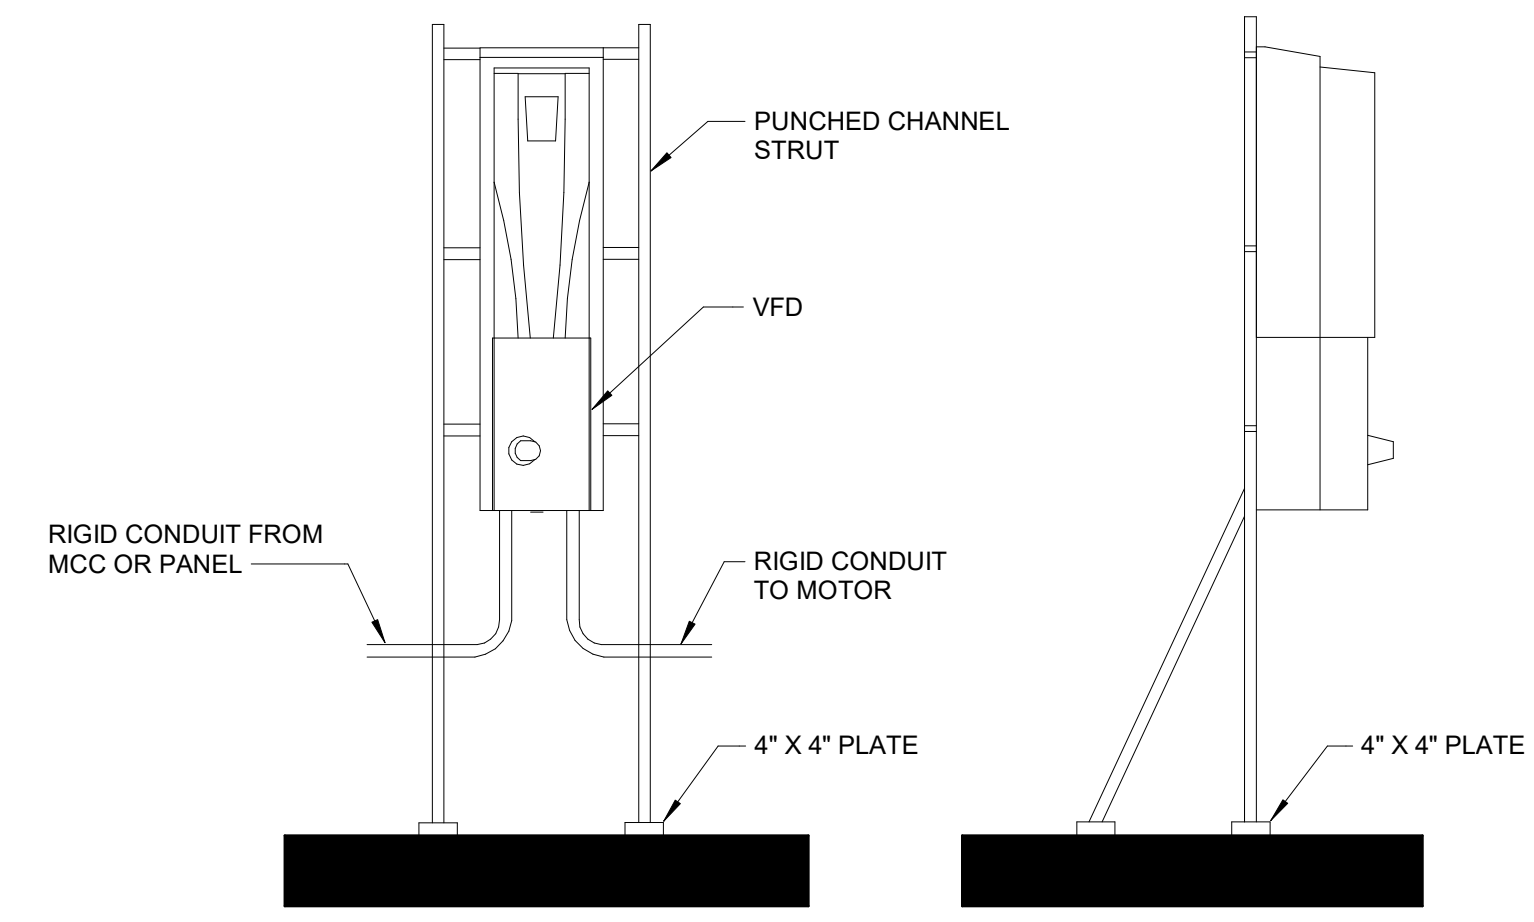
DETAIL - TYPICAL MOUNTING FOR VERTICAL CONDUIT
